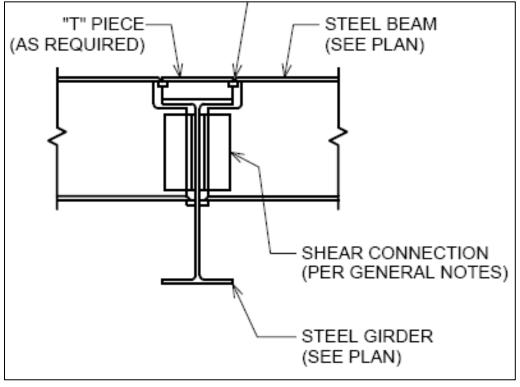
Girder to Beam Connection Details from Sheets S2.1C - Architectural Plans – WTW Architects
